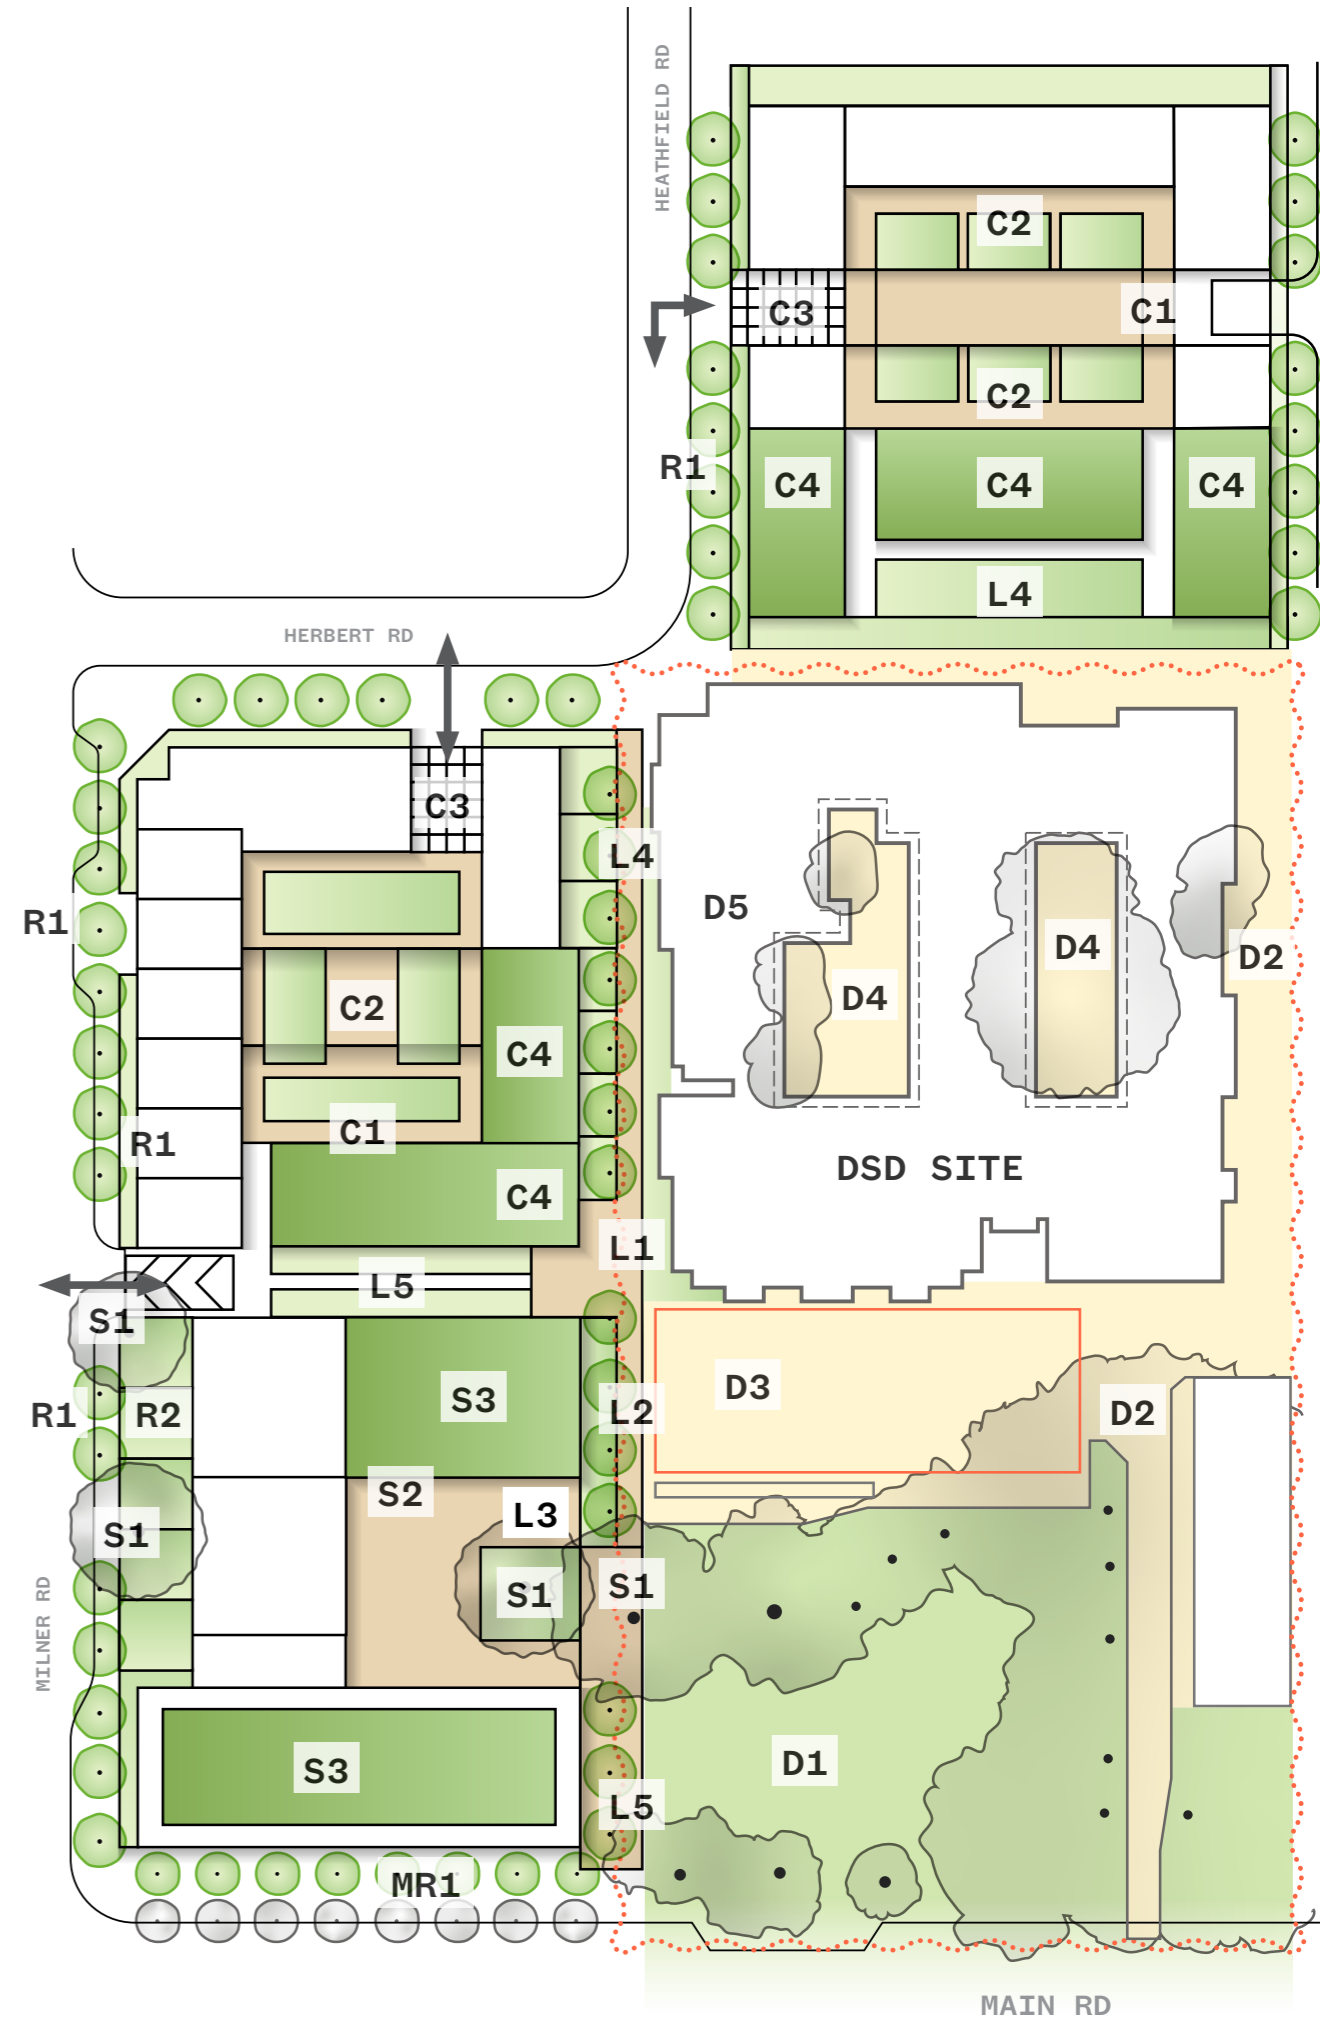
Integrated Landscape Framework Plan (Square One, 2026c: 23)
